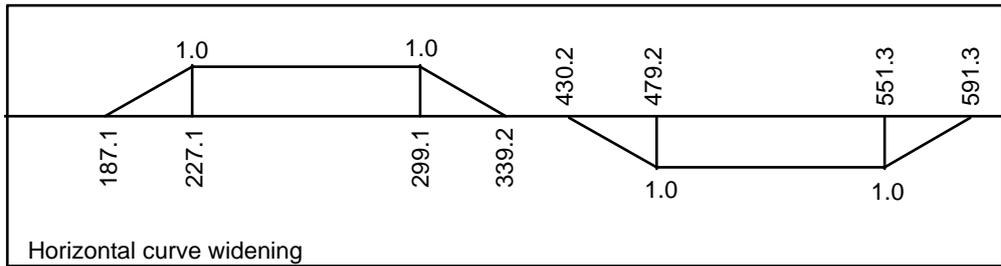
75 Example Type 1 - Horizontal widening schematic
